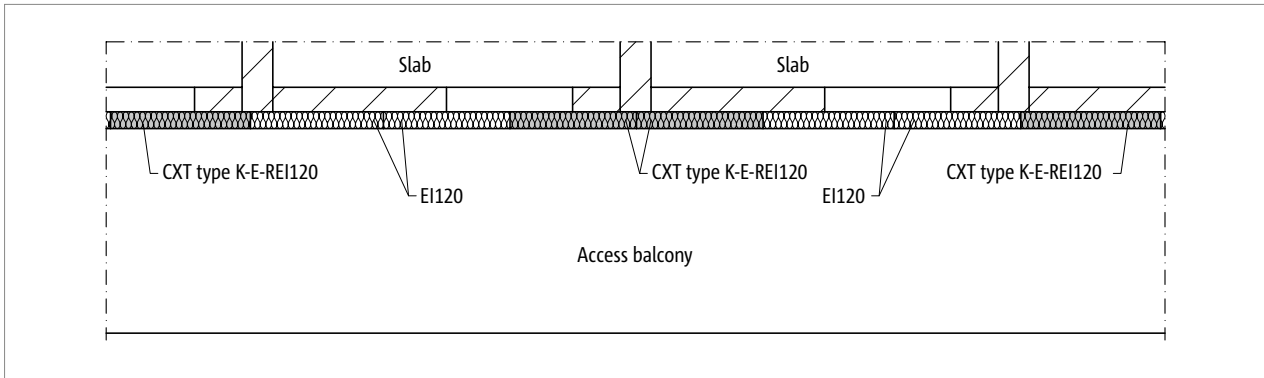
Schöck Isokorb® CXT type K-E-REI120: passageway walk, room enclosing
